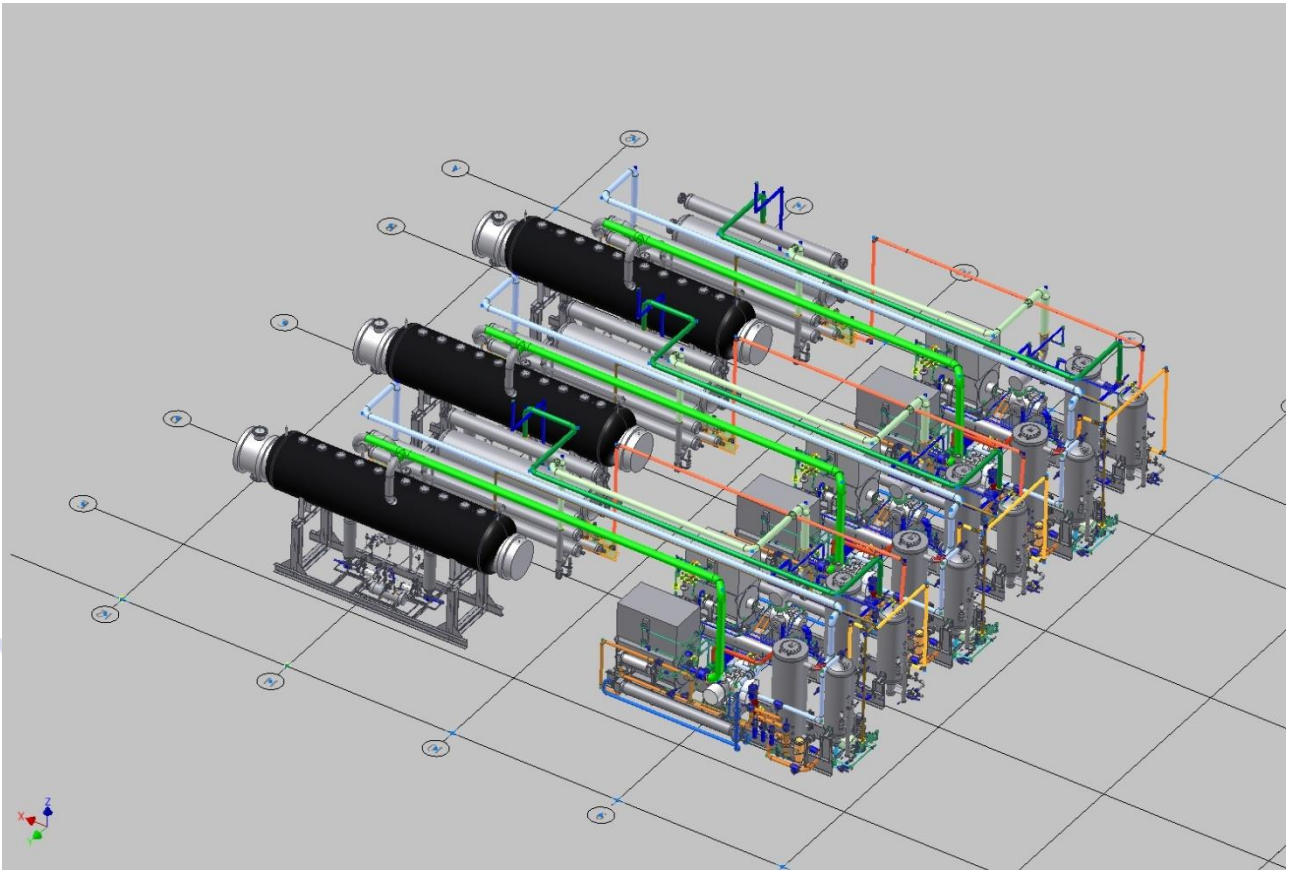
shows the equipment layout - seawater heat exchangers and 6 compressor units
